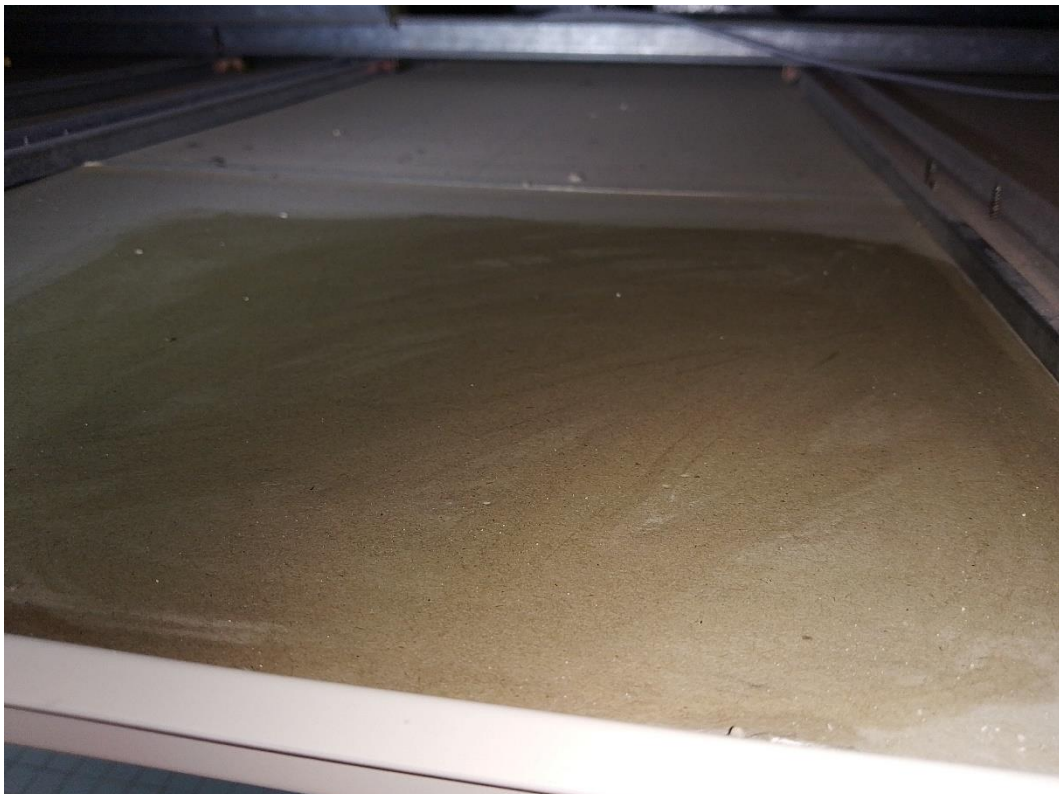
East wing, garbage room, above false ceiling, dust, lead detected.
